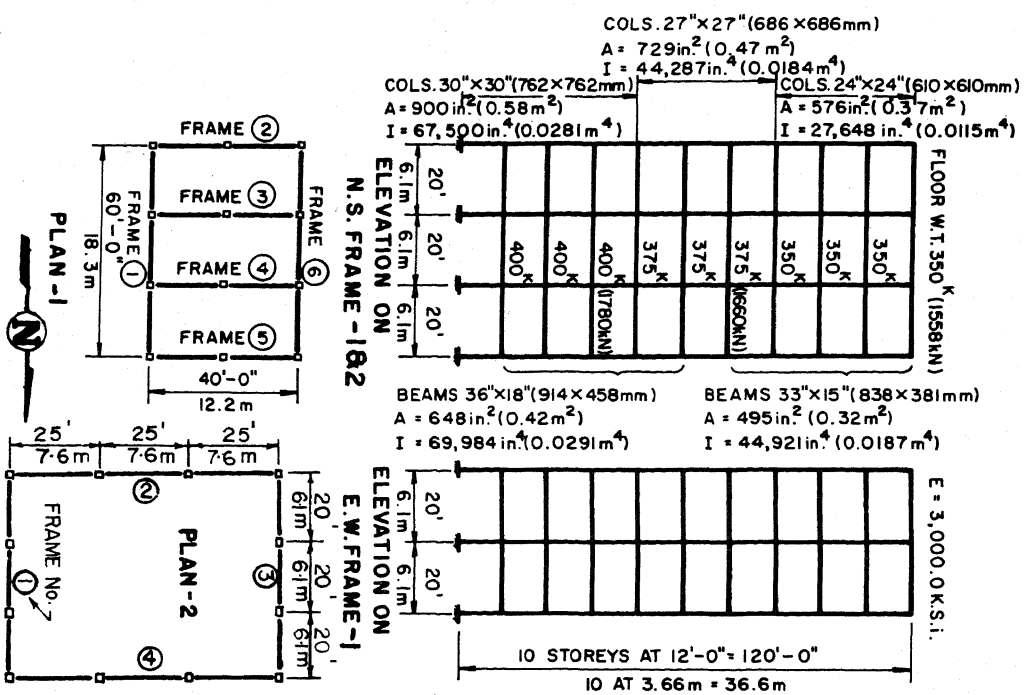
DETAILS OF TEN STOREY CRUCIFORM BUILDINGS.
